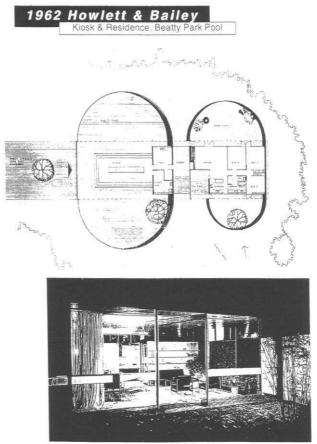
Kiosk & Caretaker's Residence, Working Drawing Floor & Block Plan, Howlett and Bailey Architects, *Beatty Park* Swimming Pool, Sheet 1, 30 May 1962.
